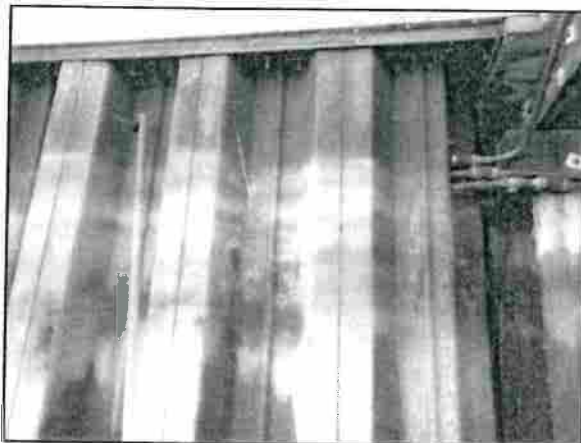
Typical condition of steel sheet pile bulkhead in the splash zone and tidal zone. Station 0+95 shown.
